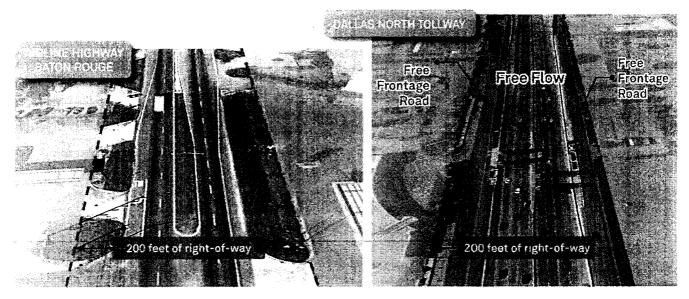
, Dallas North Tollway and Existing US 61 (Airline Highway) Baton Rouge.
